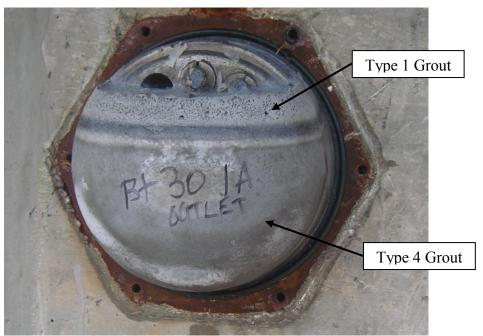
Photo. Opened anchorage on the Carbon Plant Road bridge over IH-37. (11)
